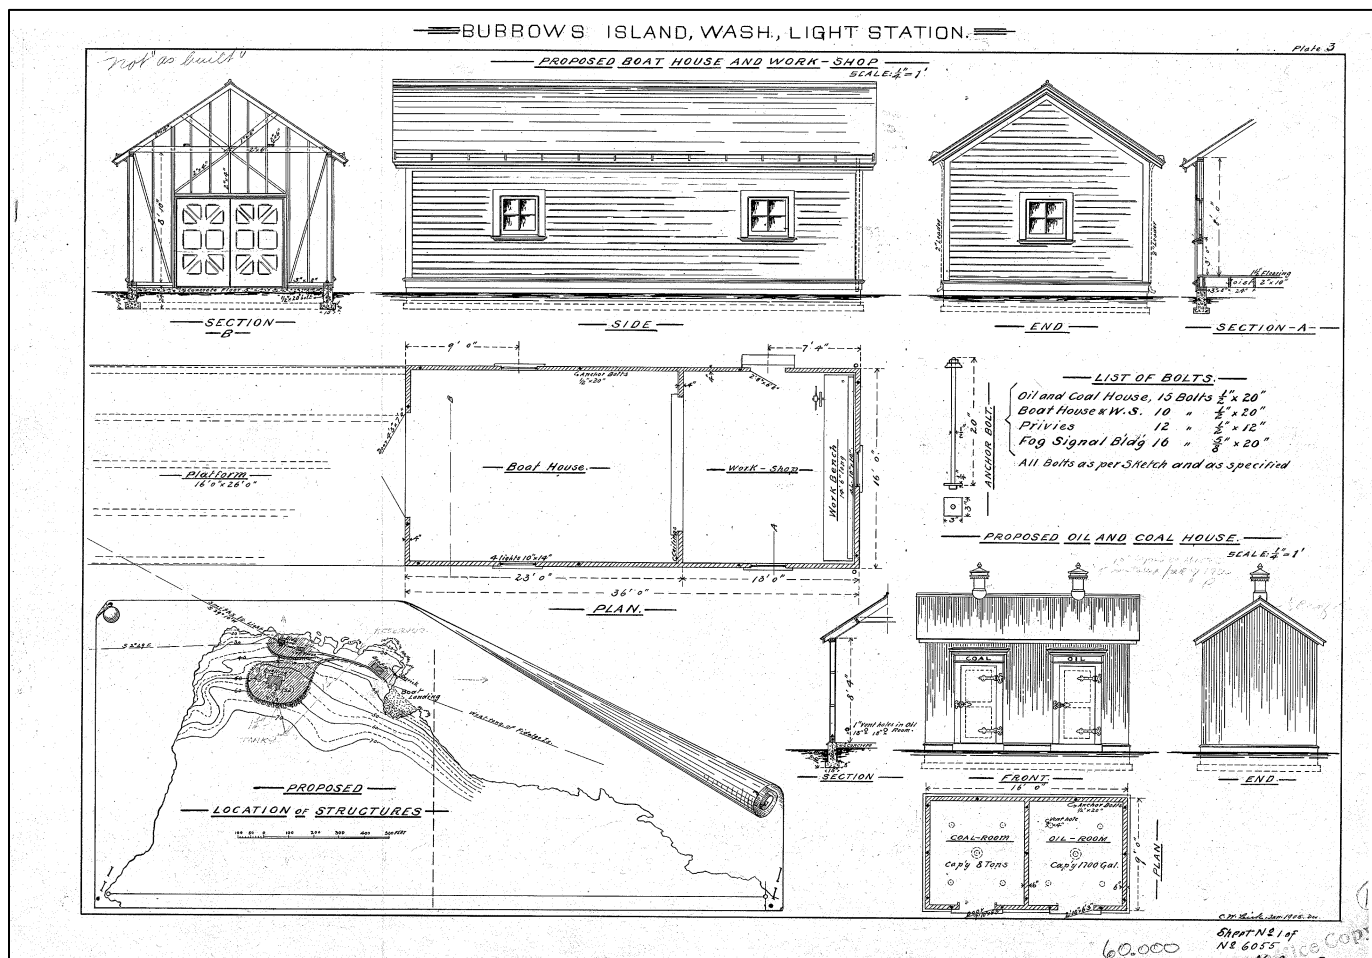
of 42: Plans, sections, and elevations of the Boathouse, Coal and Oil Building (demolished) and Workshop (now named the Boathouse) drawn by Carl W. Leick, January 1905.⁶⁷
